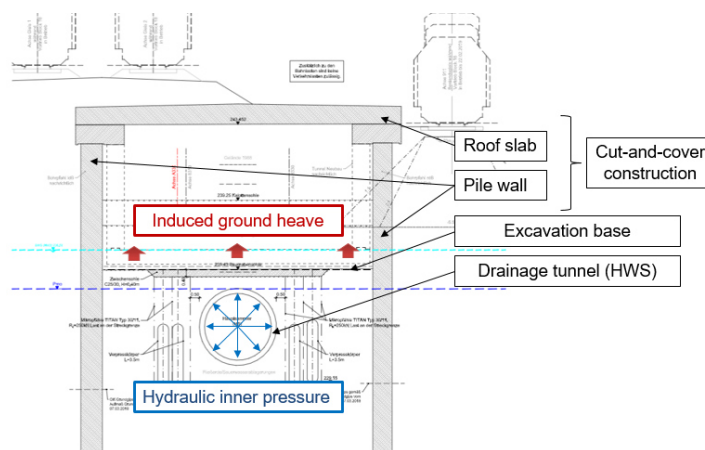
Excavation-induced ground heave below roof slab in Block 18
